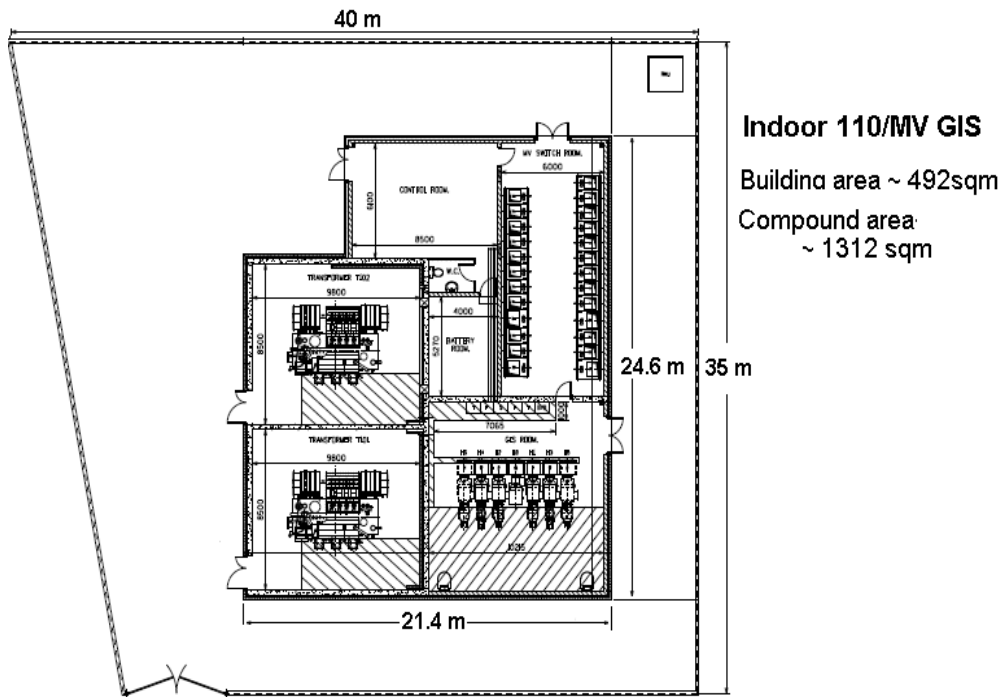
Typical 110kV/MV GIS substation – Original Design Plan
